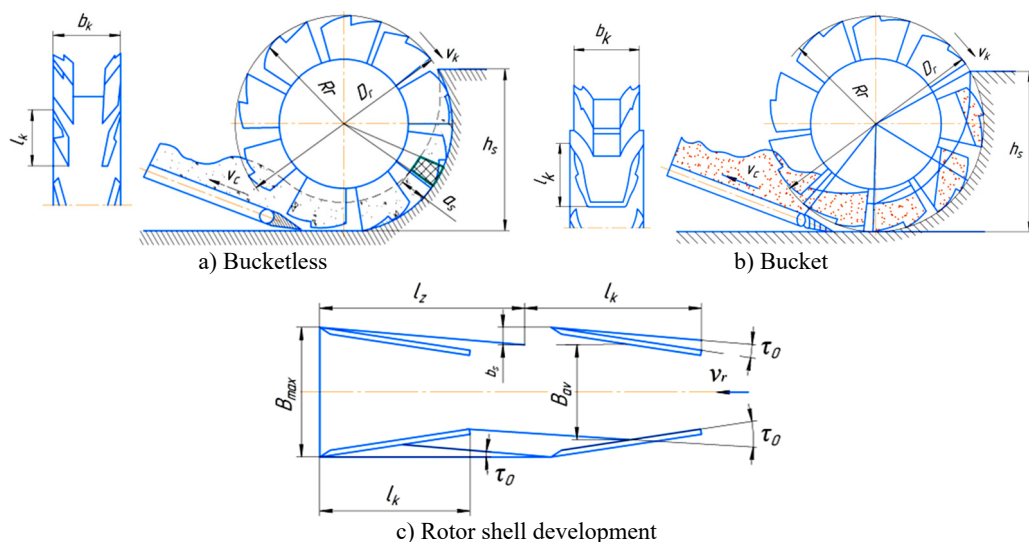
Diagrams of inertial rotors: D_r – rotor diameter; R_r – rotor radius; v_k – rotor speed; v_c – conveyor speed; h_s – chip height; a_s – chip thickness; l_k – blade length; b_k – blade width; v_r – cutting speed; τ_0 – kinematic cutting angle; b_s – chip width; B_{max} – maximum distance between the blades; B_{av} – the average distance between a pair of blades converging at an angle of 2τ degrees; l_z – distance between the blades
